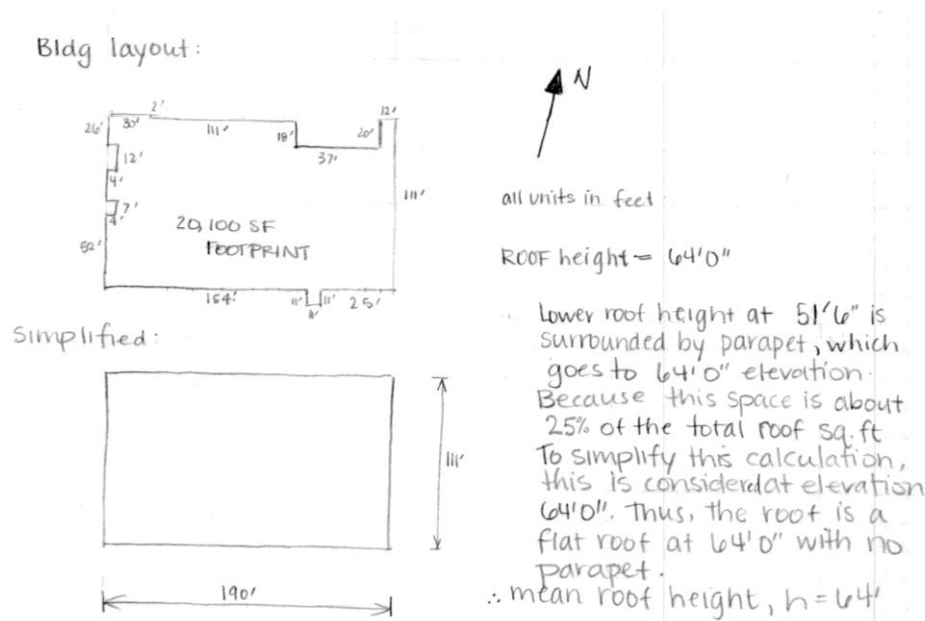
Building dimensions simplified for wind load calculations following Method 2.
